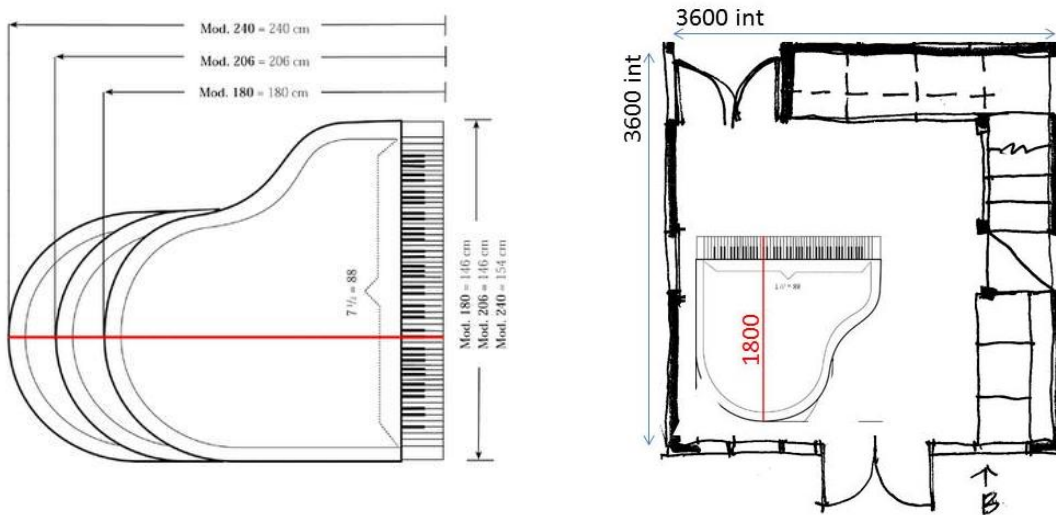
Design study – a baby grand piano fits in a room with 3600 x 3600mm internal clear dimensions
